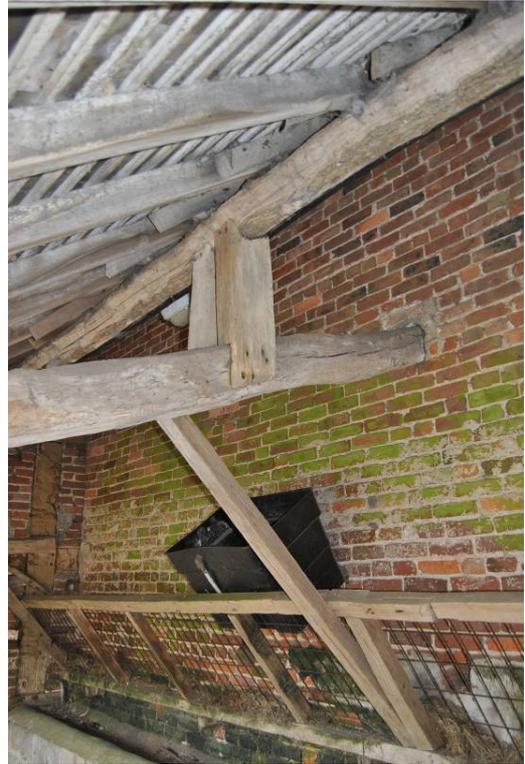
Angled tie with vertical struts supporting longitudinal purlin.
